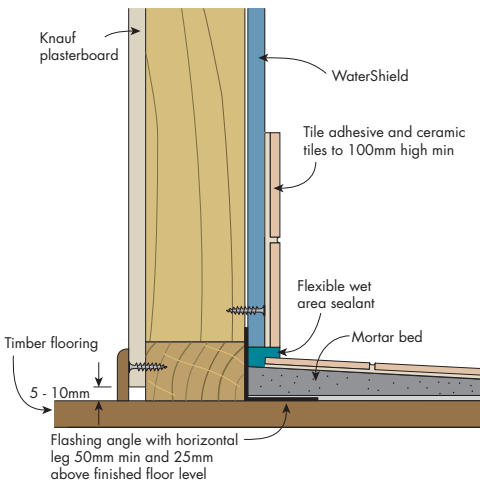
Wall Base in Wet Areas (Outside Shower)
